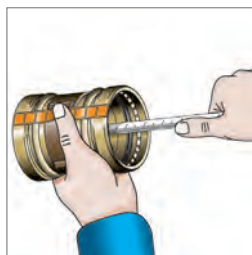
Push the press connector up to the marked insertion depth on the pipe.
